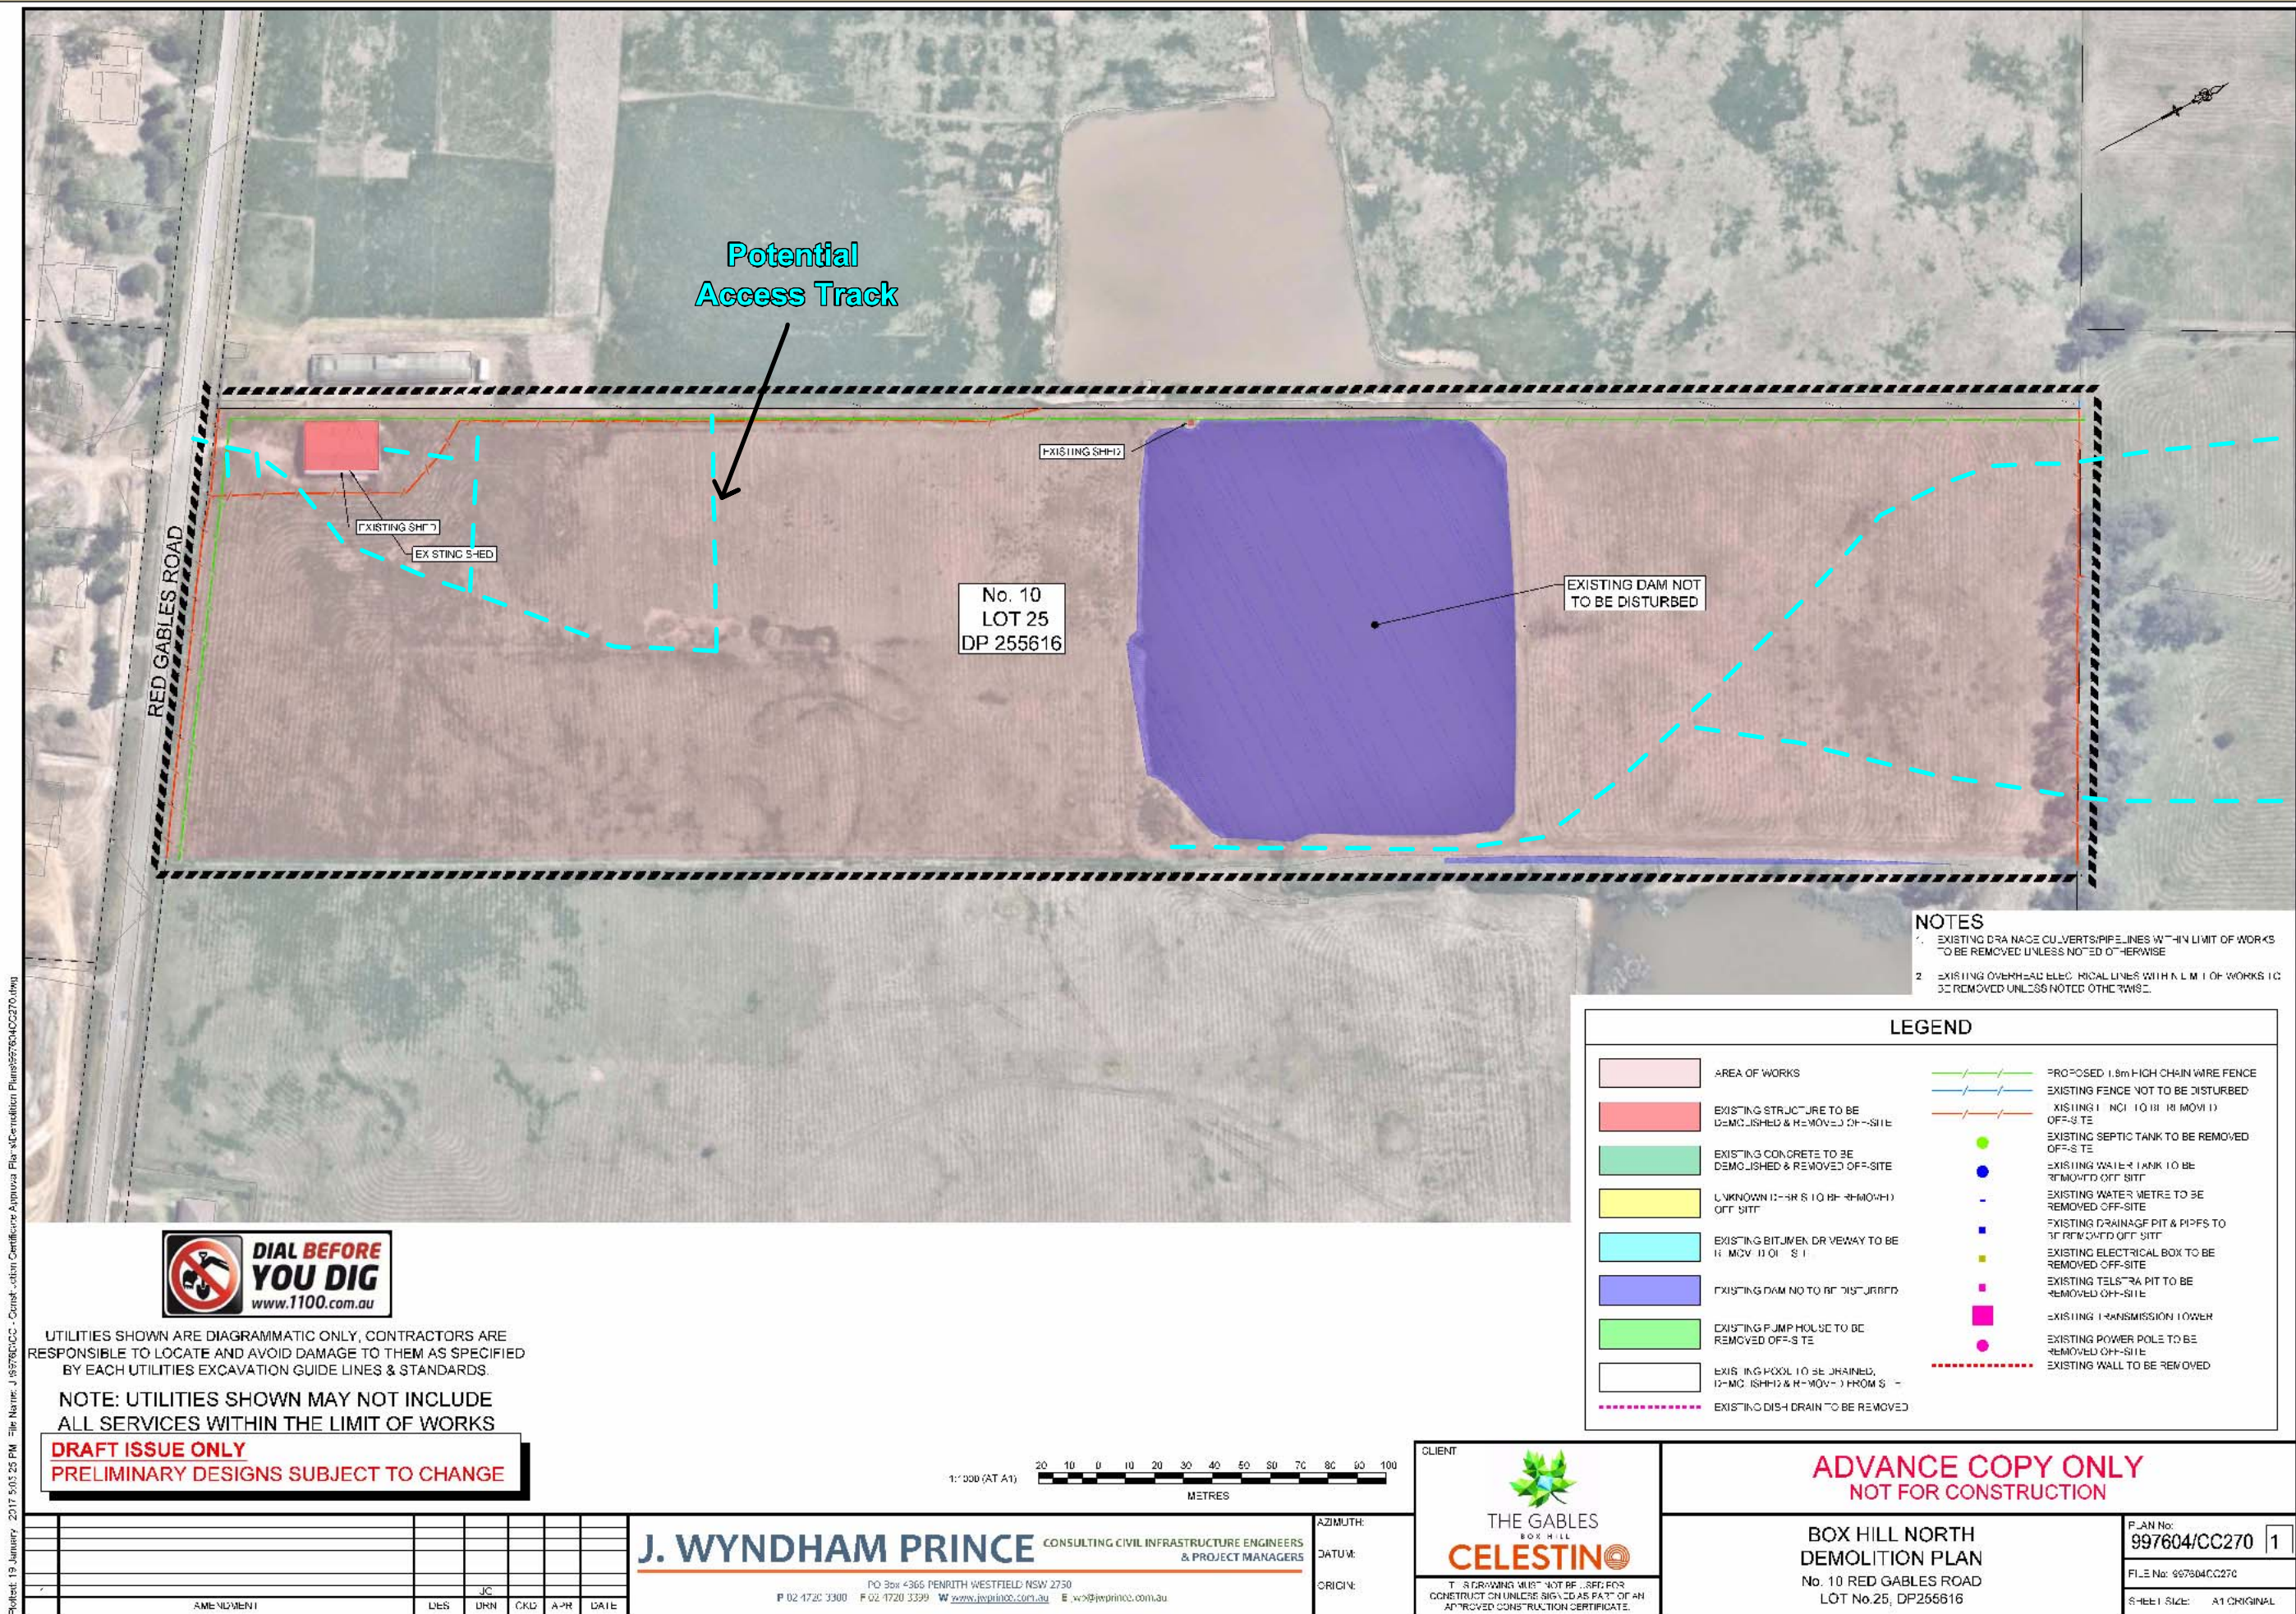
Demolition Sites and Potential Access tracks for 10 Red Gables Road
